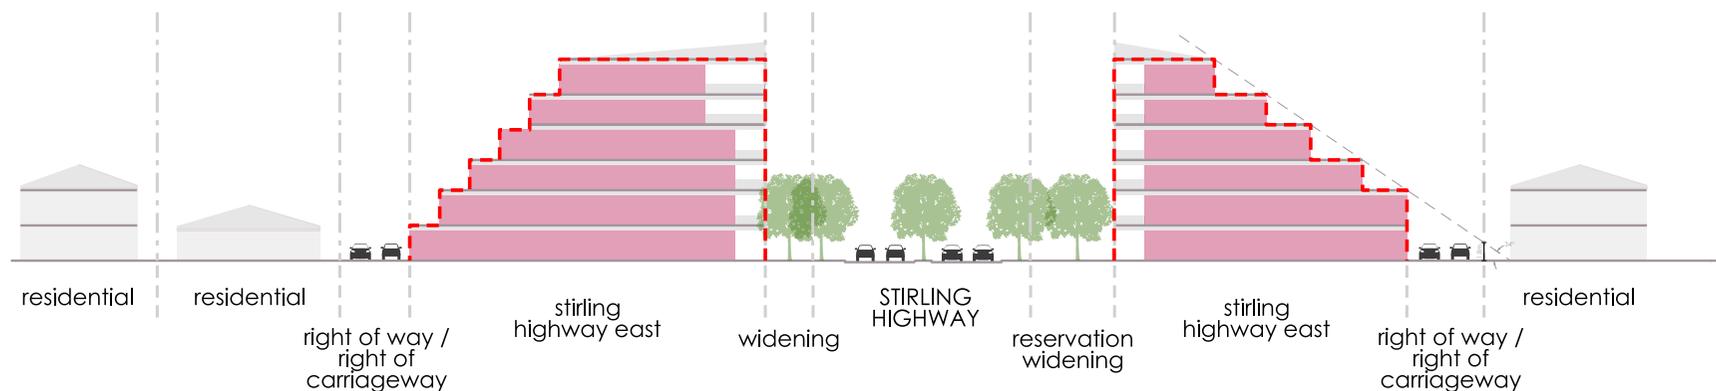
Cross Section A-A shown spatially on Figure 12, outlining the potential built form envelope for new development within the Stirling Highway East Urban Corridor Planning Area.
